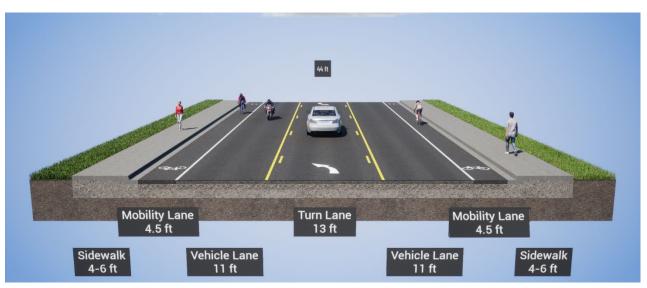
Proposed Typical Roadway Configuration of Segment 1B (Fort Vancouver Way): Fourth Plain Boulevard to 29th Street (looking north)
